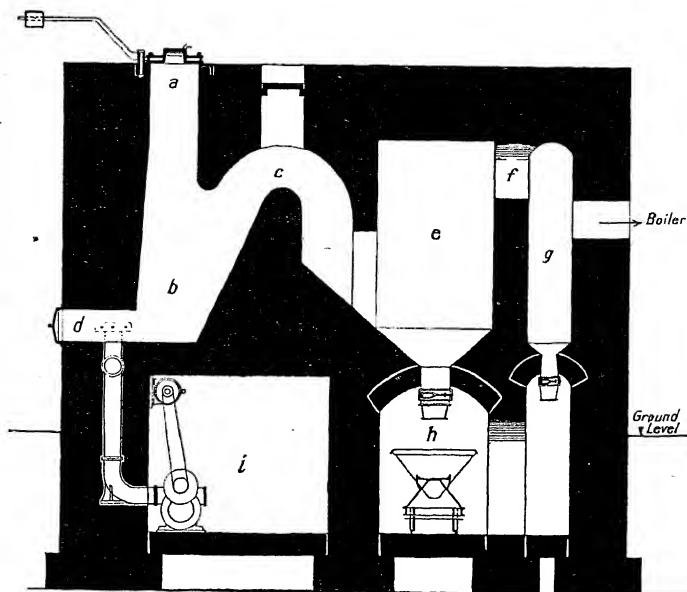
Dörr Destructor, Wiesbaden. Cross-sectional view through cell.
